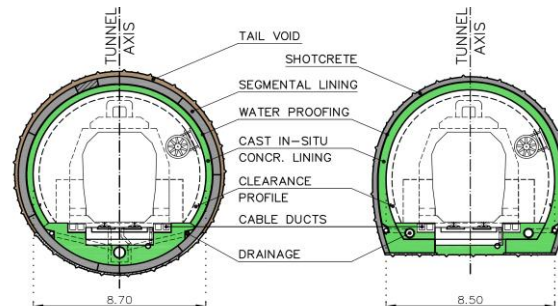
Alternative cross sections of the proposed Trikokkia Tunnel (TMB and NATM sections)
